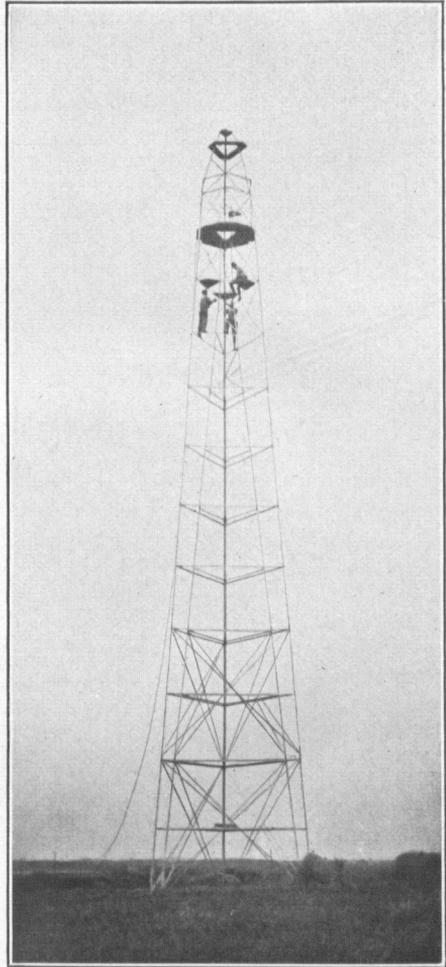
Outer structure complete; top section being bolted on inner structure
